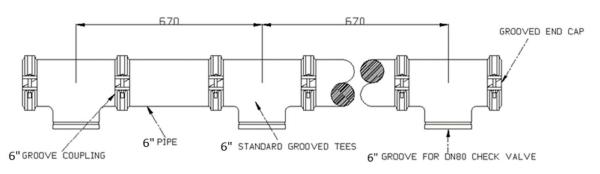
Manifold Information for 3" Valve and DN80 Check Valve
